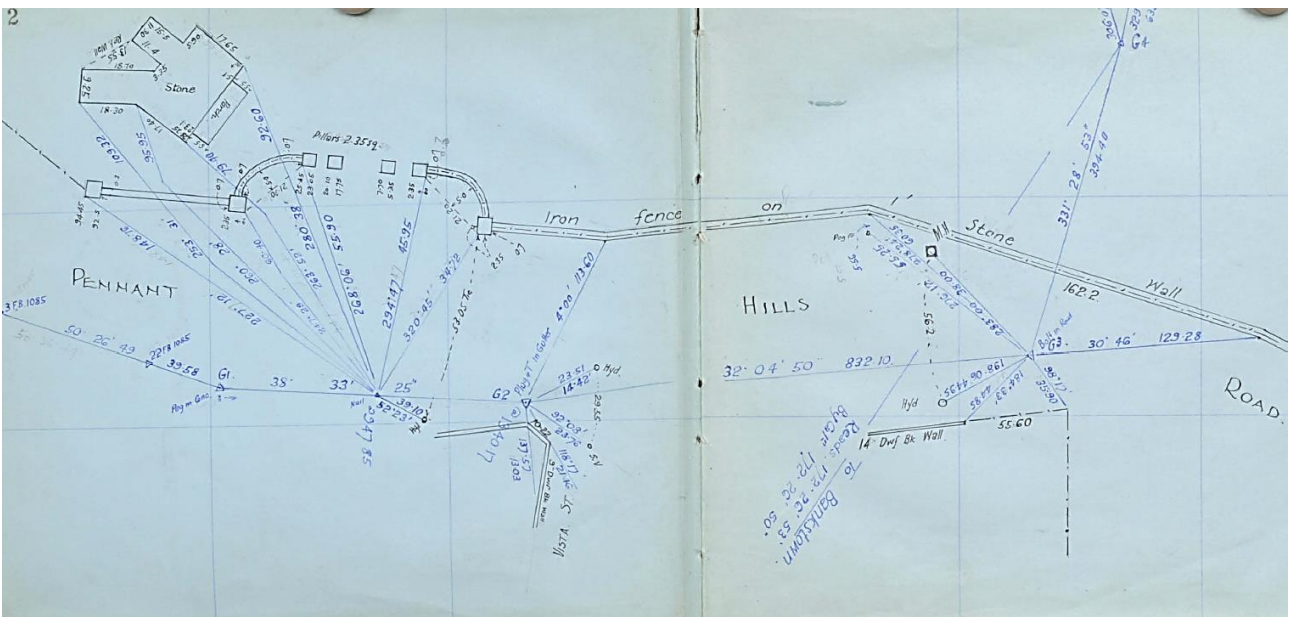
1942 detail sheeting indicating sandstone wall with iron fence along Pennant Hills Road and Gatehouse, which remains extant. Note presence of water connections evidence at this time.
